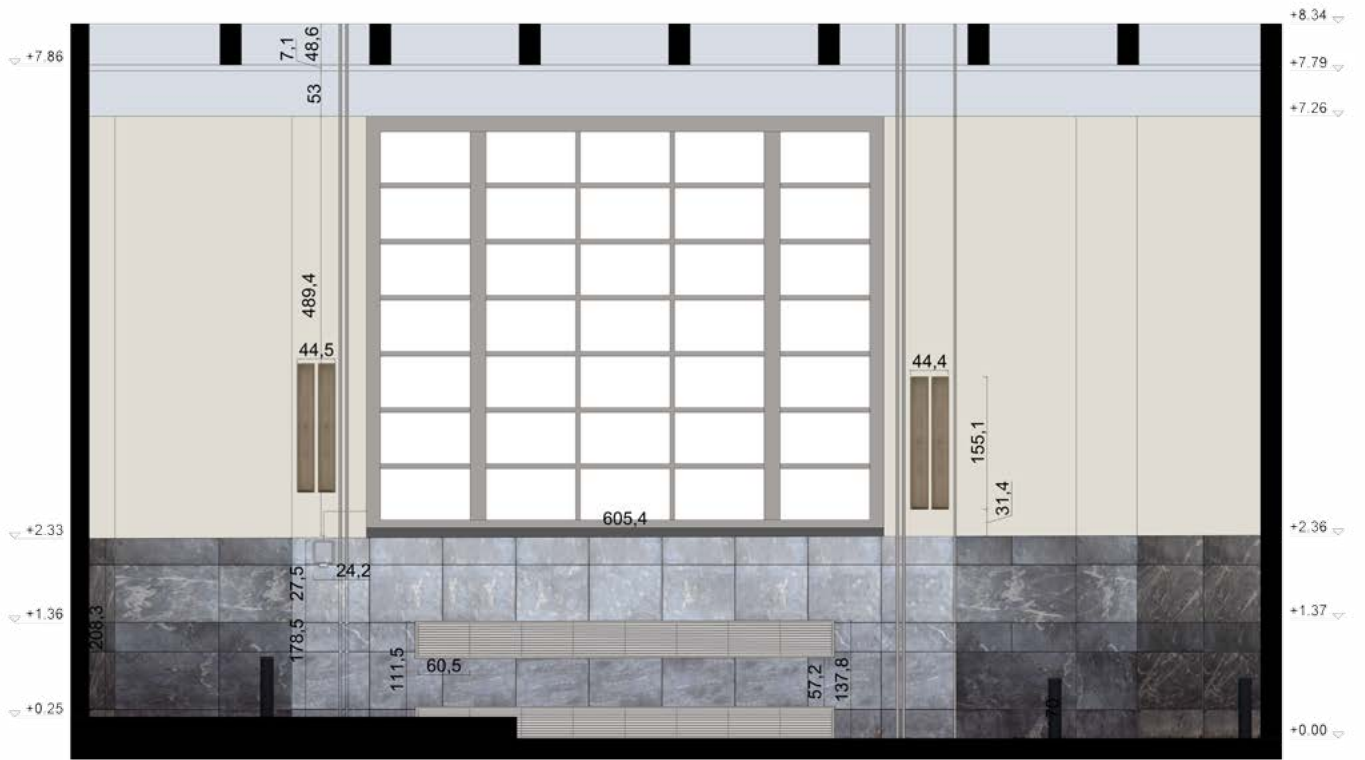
Stefanini Room Section AA - South wall.
